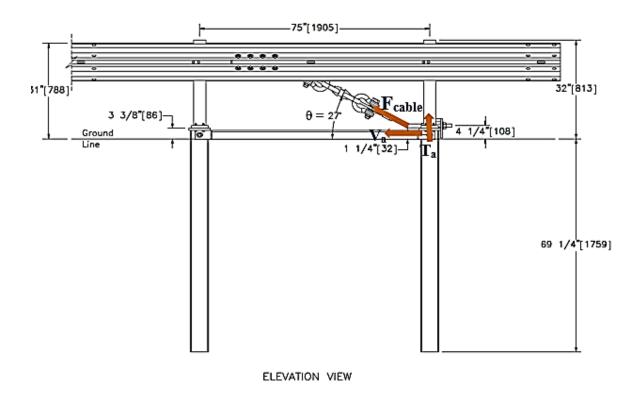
Modified UBSP Downstream Anchorage Design Concept No. 4
